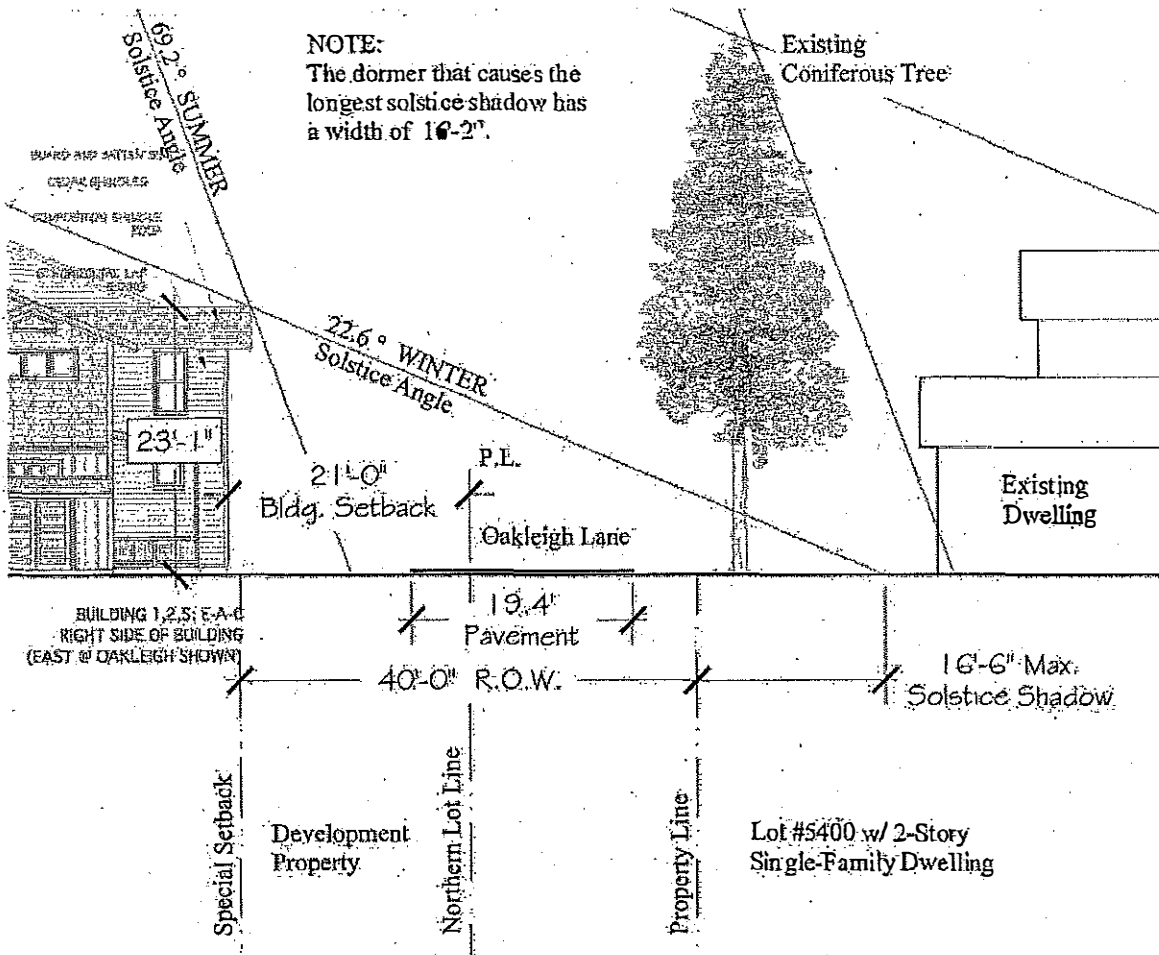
Solar Section of Building 1 showing the proposed building setback and effective shadow lengths relative to adjacent property lines, existing natural features, and existing dwellings.
